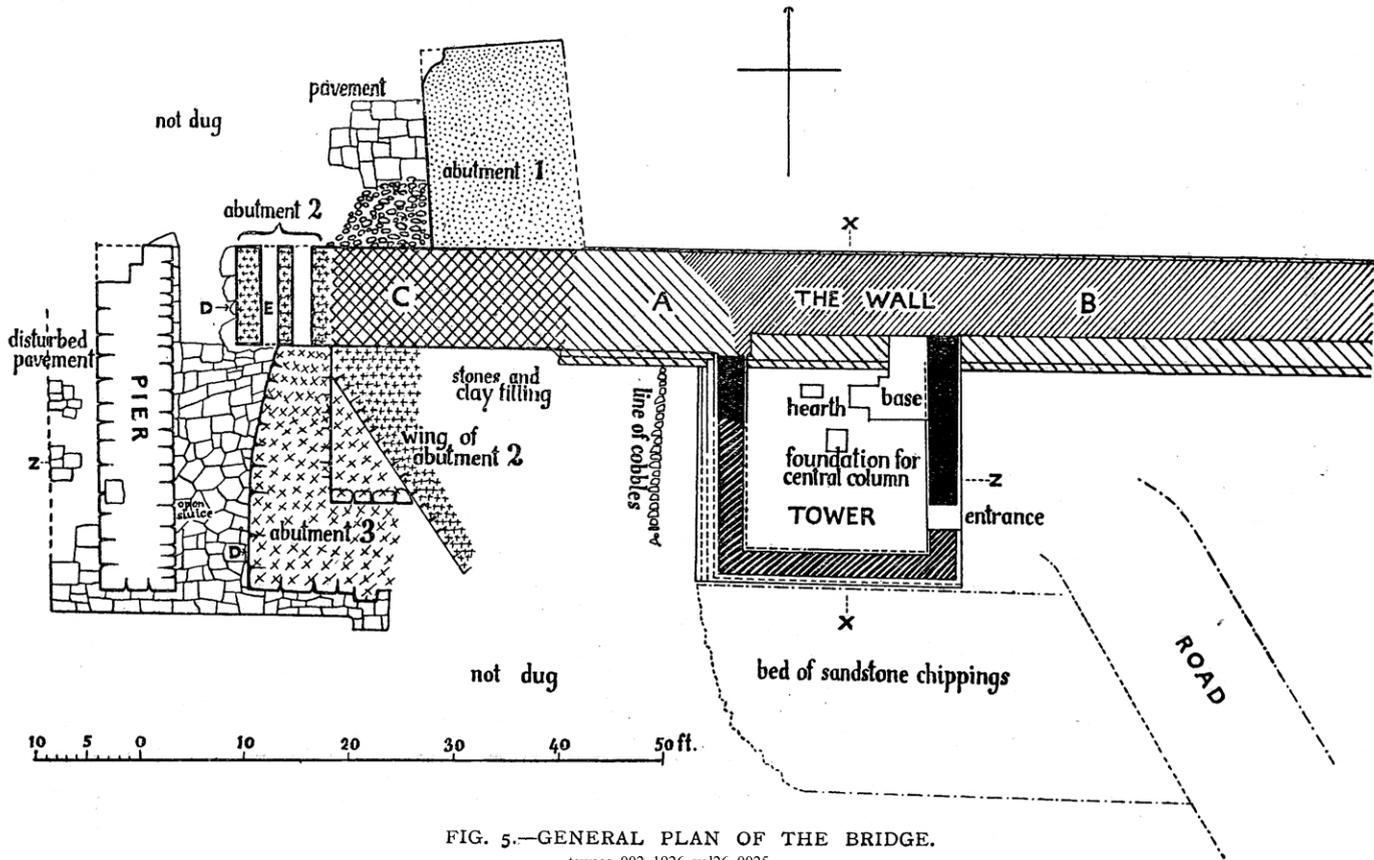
GENERAL PLAN OF THE BRIDGE.
